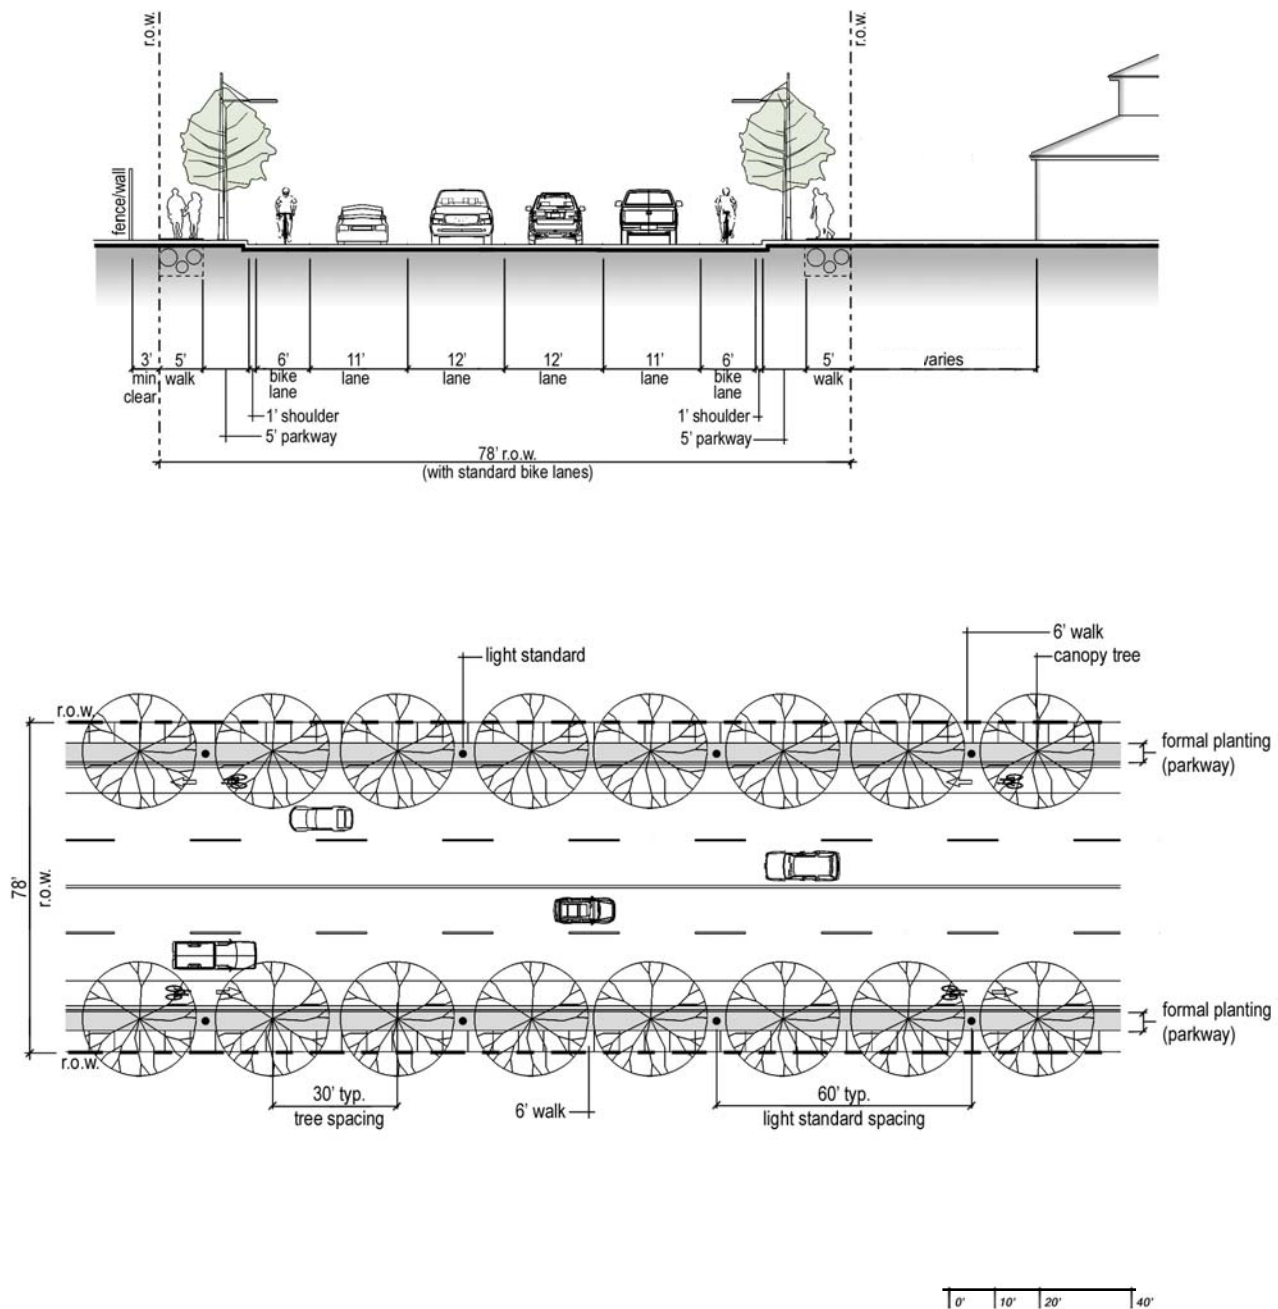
Typical Collector Section & Plan: Major Collector
